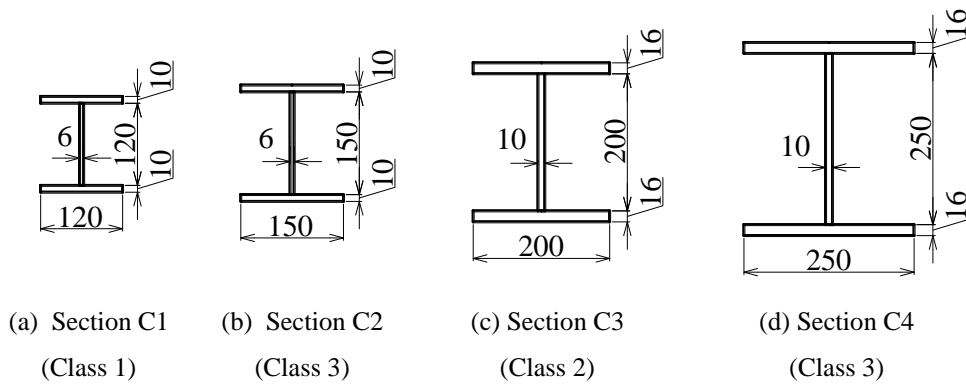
Cross-section dimensions of Q690 welded H-sections
